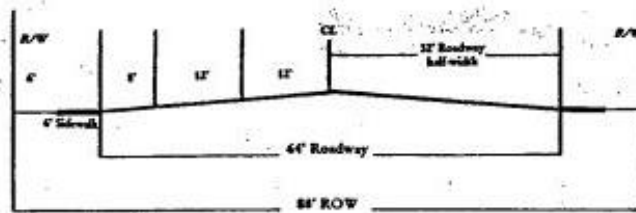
MARCH JPA GENERAL PLAN ROADWAY CROSS-SECTIONS
